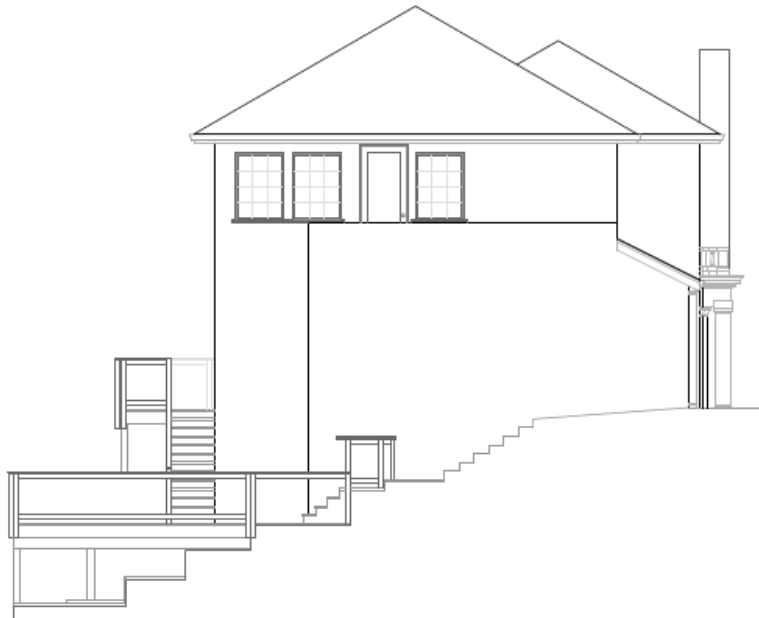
671 Longridge Road, Rear Elevation, 2021
